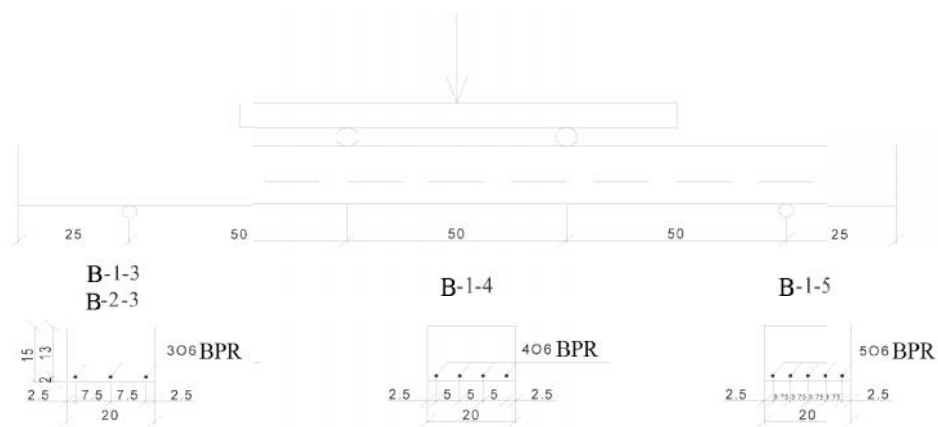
Diagram of reinforcement and loading of prestressed beams
